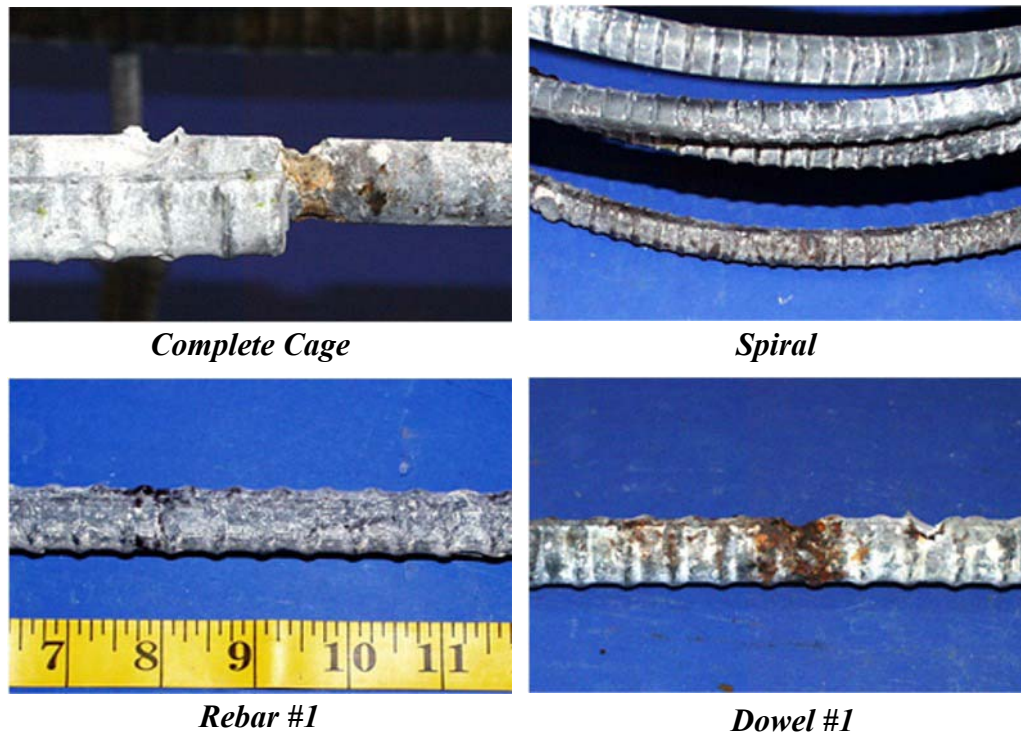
Reinforcement Condition for Specimen DJ-FA-S
